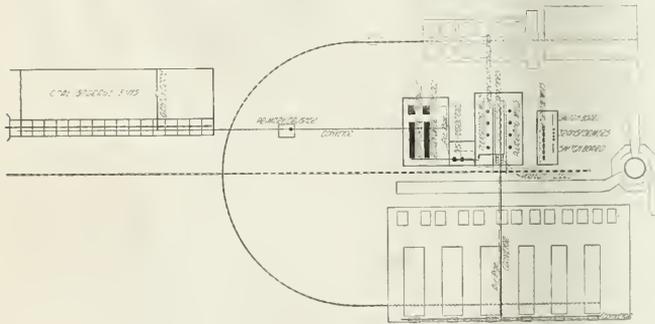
GENERAL PLAN OF COAL-PULVERIZING PLANT
